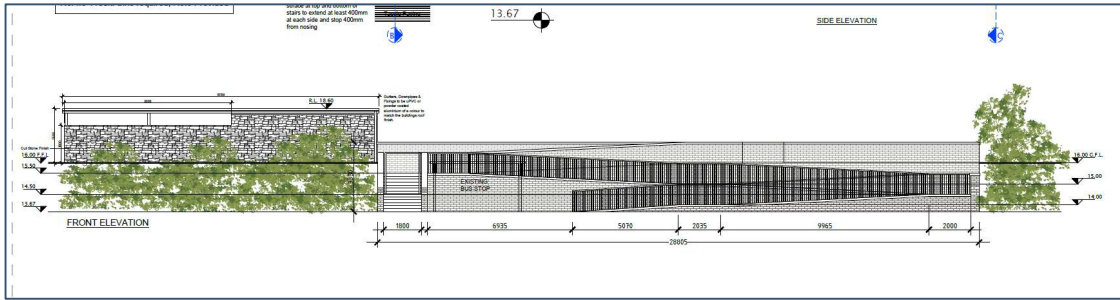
Ramp Technical Detail (extract from drawing 18128-3290)
